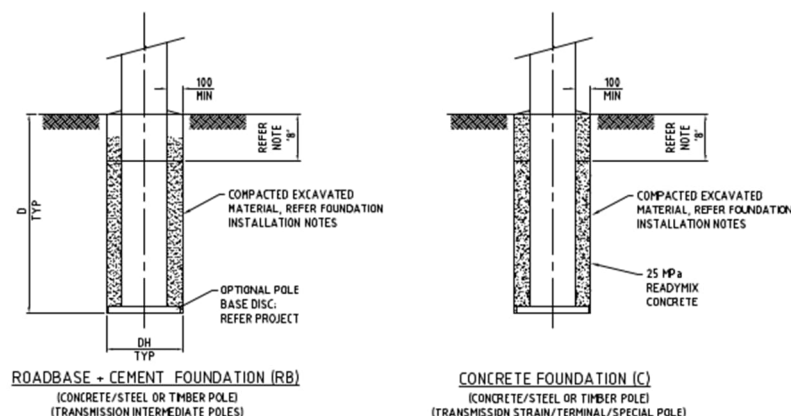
Rev B has been updated to Rev C, replacing Plain foundation with Road base and Cement foundation. Detailed changes to the drawing can be found in Annexure A.
